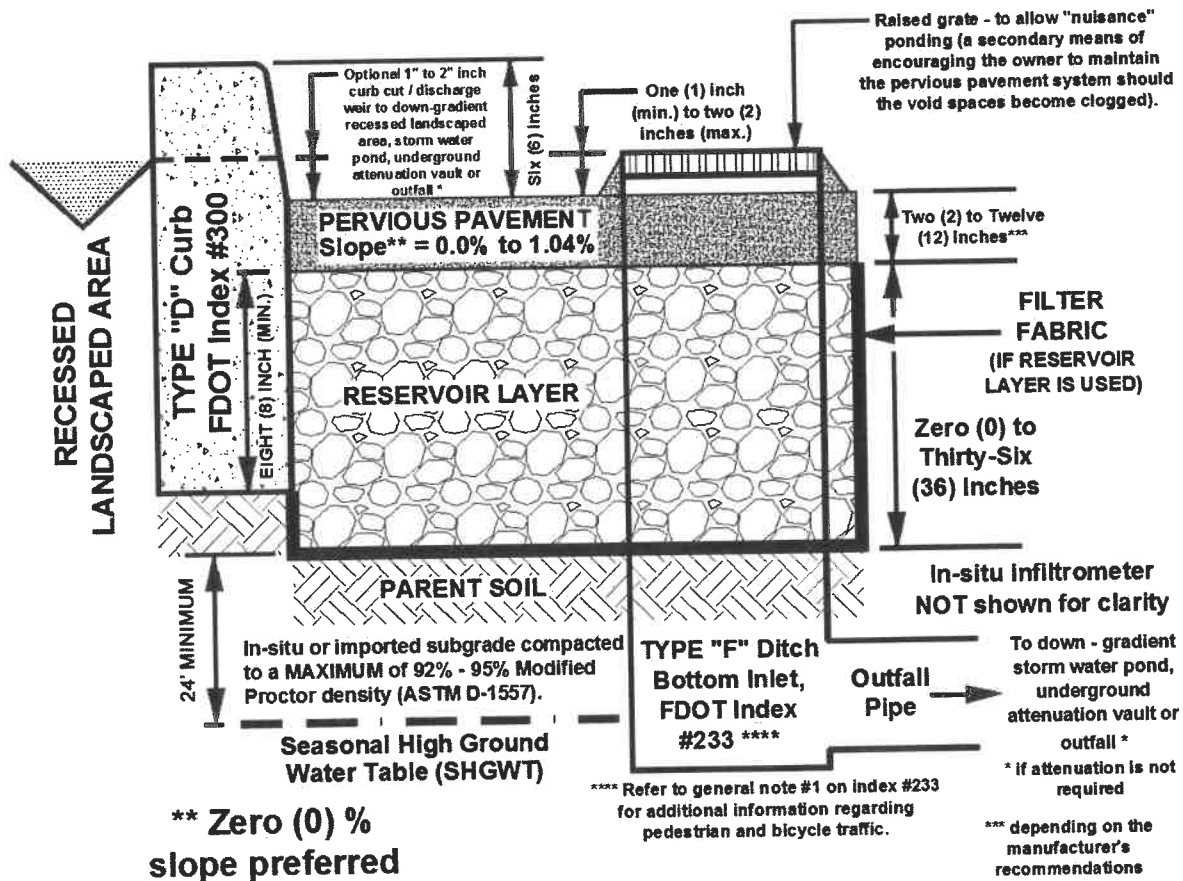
Pervious Pavement System Cross Section #1.
